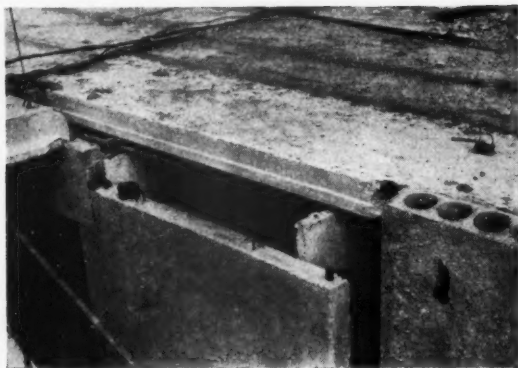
Precast concrete panel wall construction at New Cheremushki showing services cast-in to the structural panels. On the right is a staircase wall panel with vent ducts from adjacent kitchens. In the centre panel are three metal pipes for services—on the left water and soil, on the right gas. Connections are by site welding.
